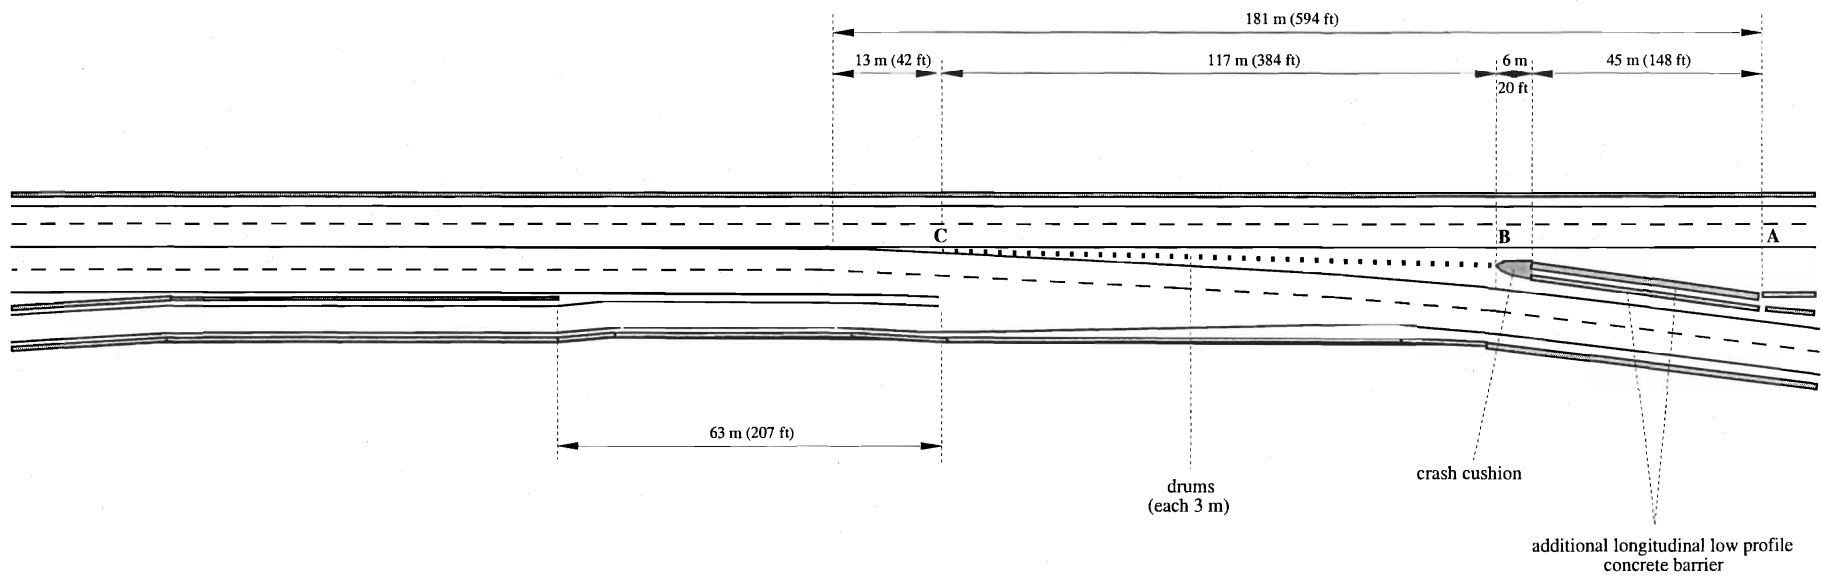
Geometric scheme, protective barrier locations and pavement markings on the investigated highway section
